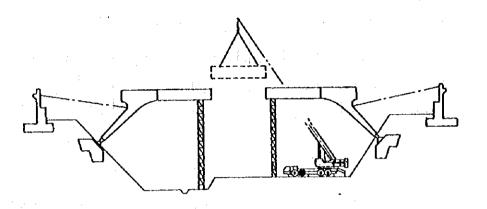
Erection Method for Diagonal Strutted Rigid-frame Steel Girder
